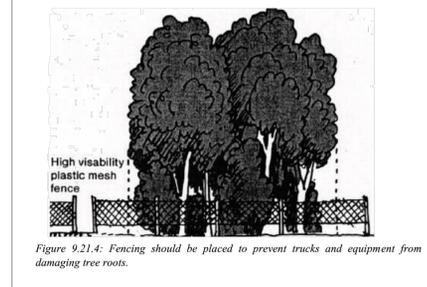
Fencing should be placed to prevent trucks and equipment from damaging tree roots.
